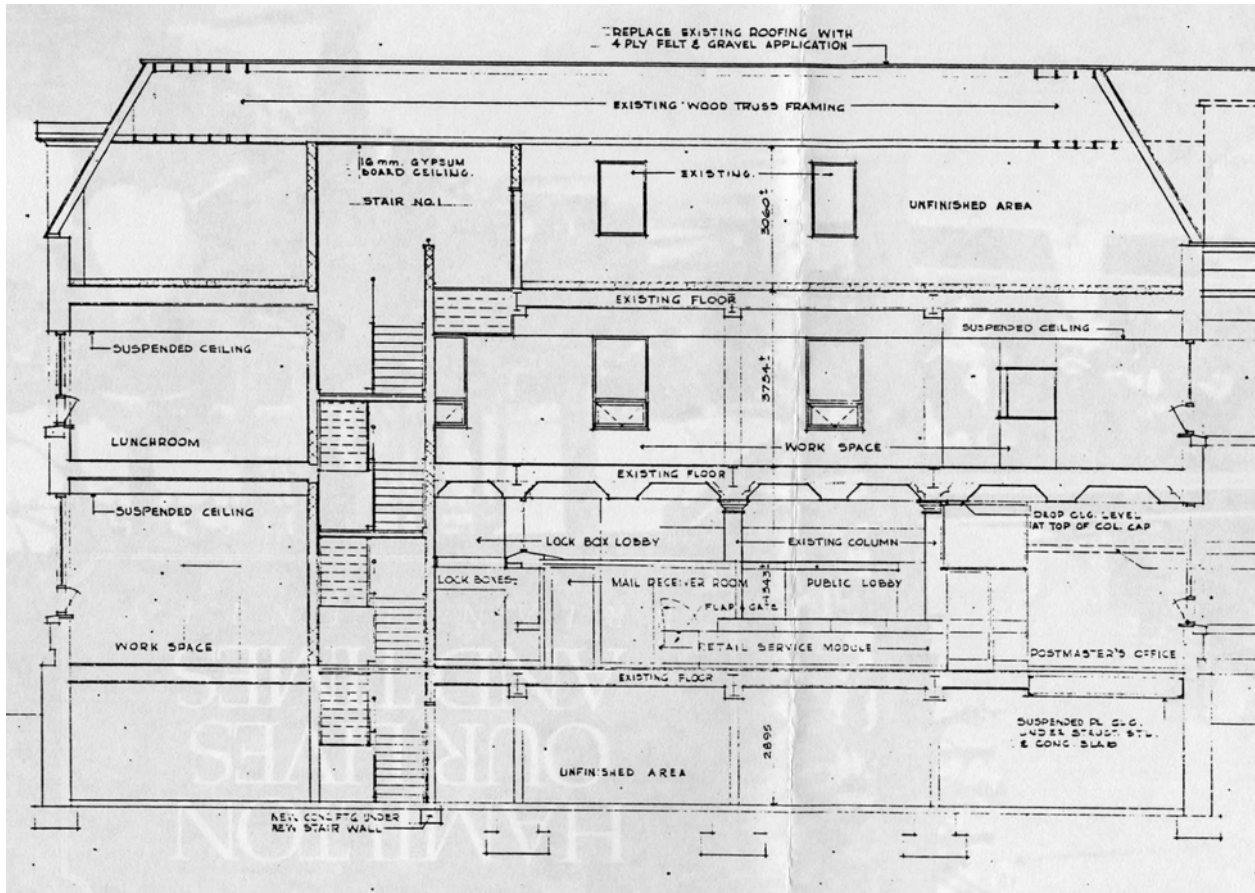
Drawing No. A10: East-west section from the 1978 set of drawings for proposed renovations and additions, looking south. Shows the new central concrete block stairwell from the basement up to the third floor. Also shows the new Lock Box Lobby, the Mail Receiver Room and the front of the new Retail Service Module, which replaced the 1950 counter.
